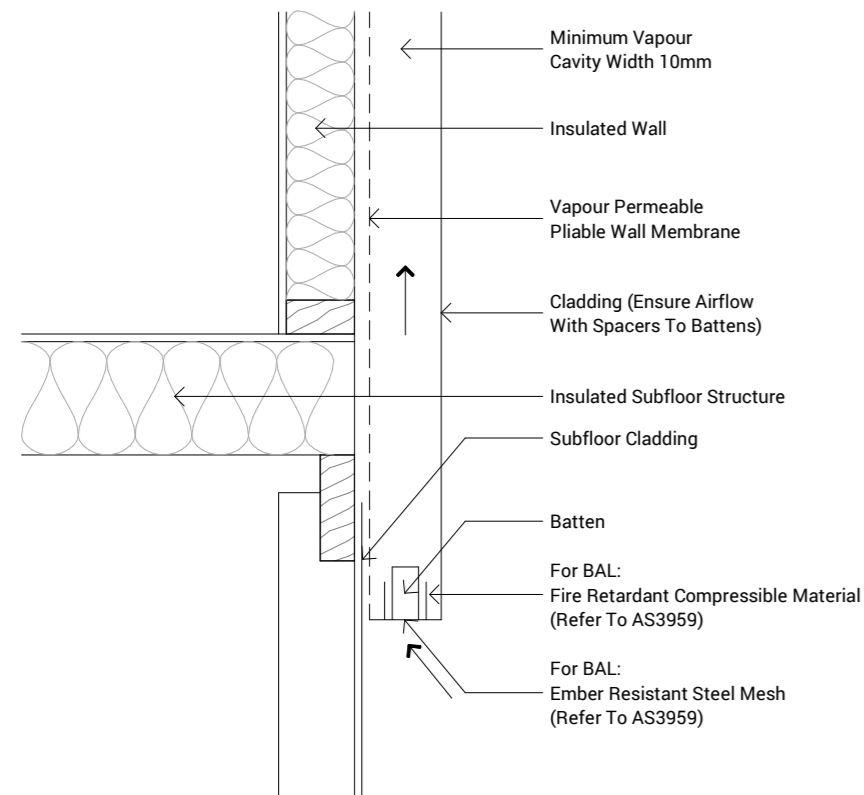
SUSPENDED TIMBER FLOOR WITH HORIZONTAL BATTENS
